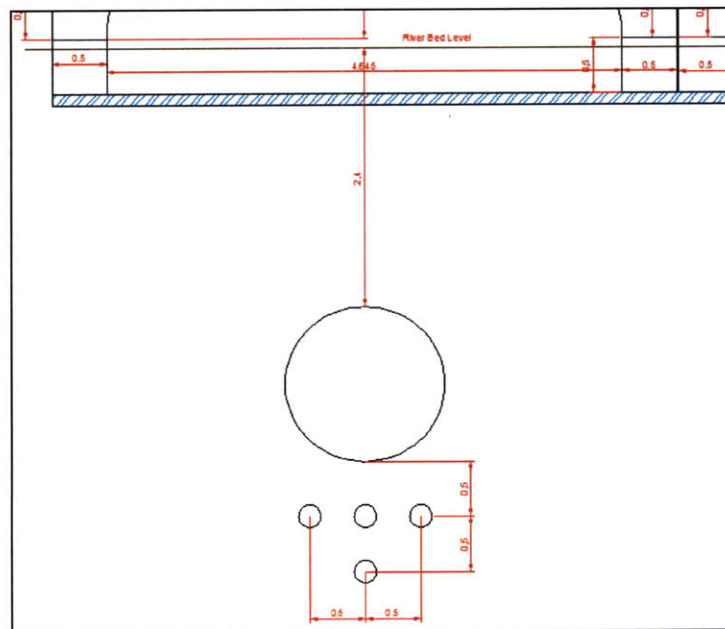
Alignment of HDD grouting under tunnel (dimensions in m)
